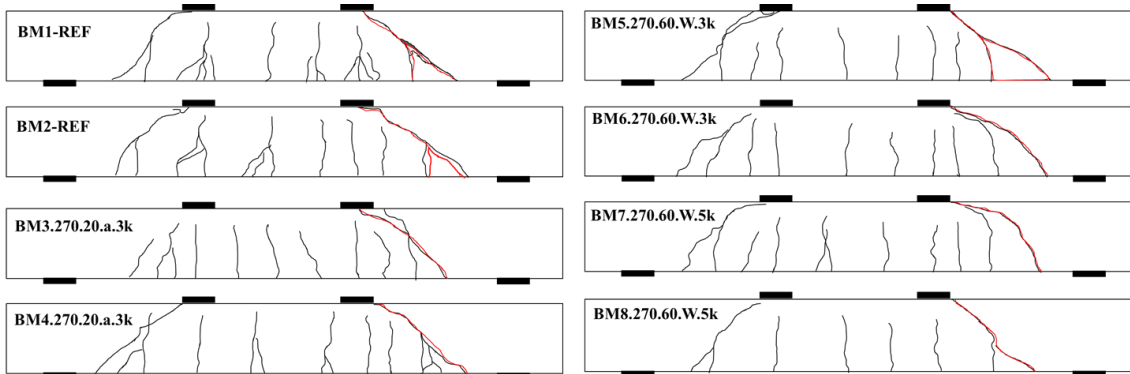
Crack pattern at failure of tested beams the red colour is failure crack.
